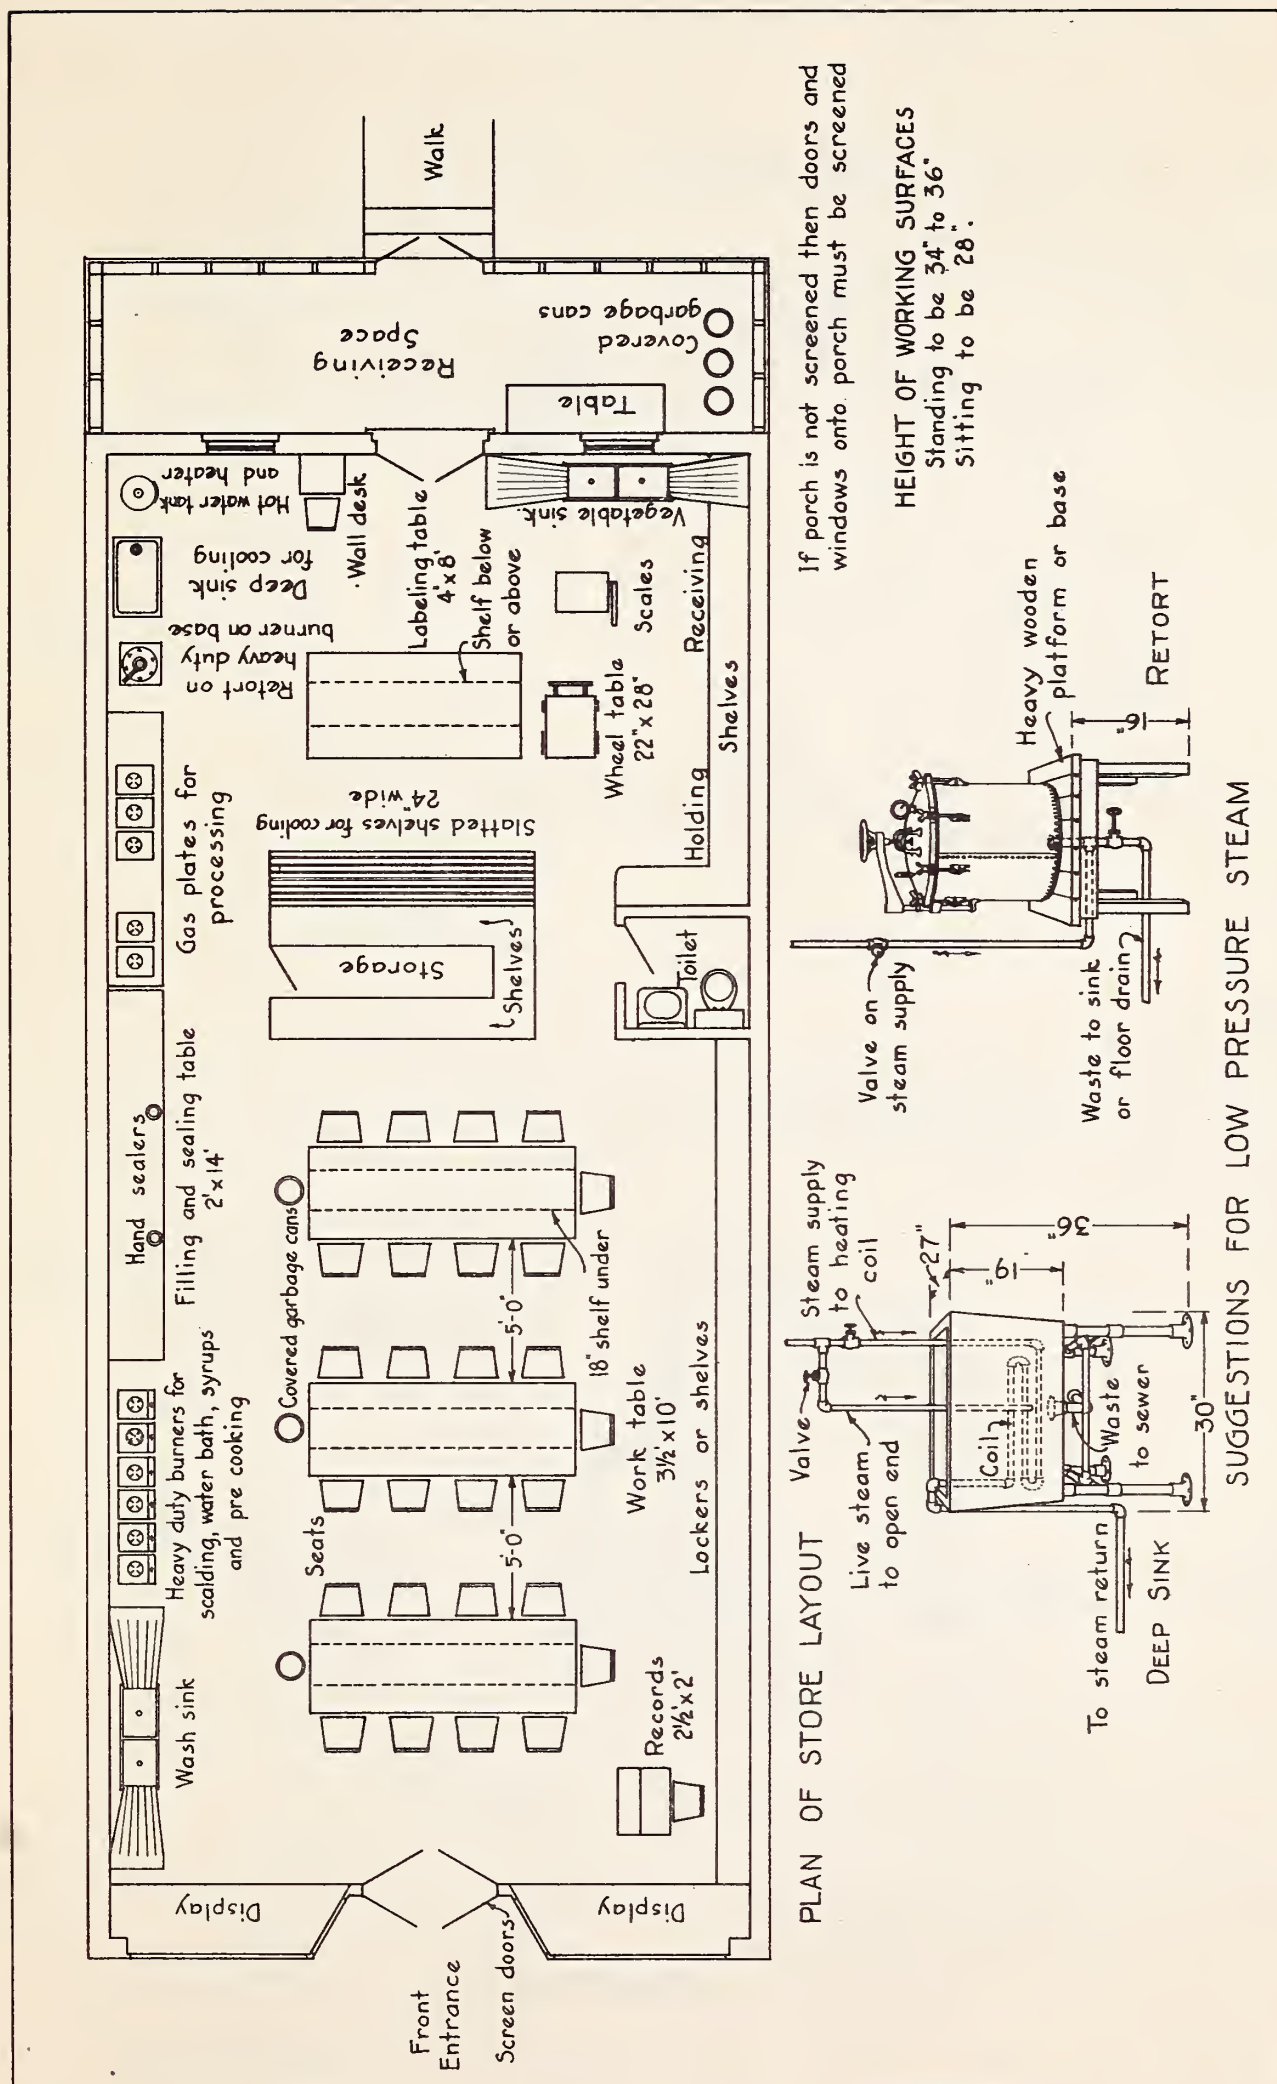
SUGGESTED LAYOUT FOR COMMUNITY CANNING CENTER IN A 24 FEET BY 65 FEET STORE BUILDING WITH GAS INSTALLATION
